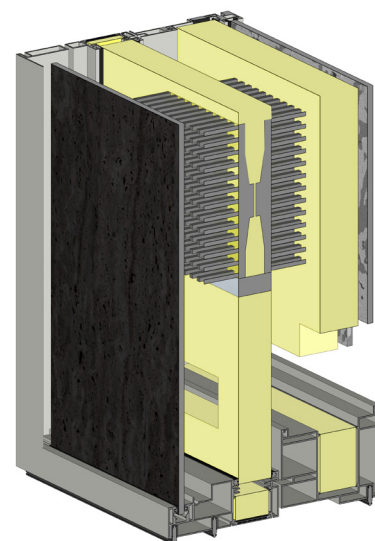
vertical detail of connection between a TE facade and a glazed facade
